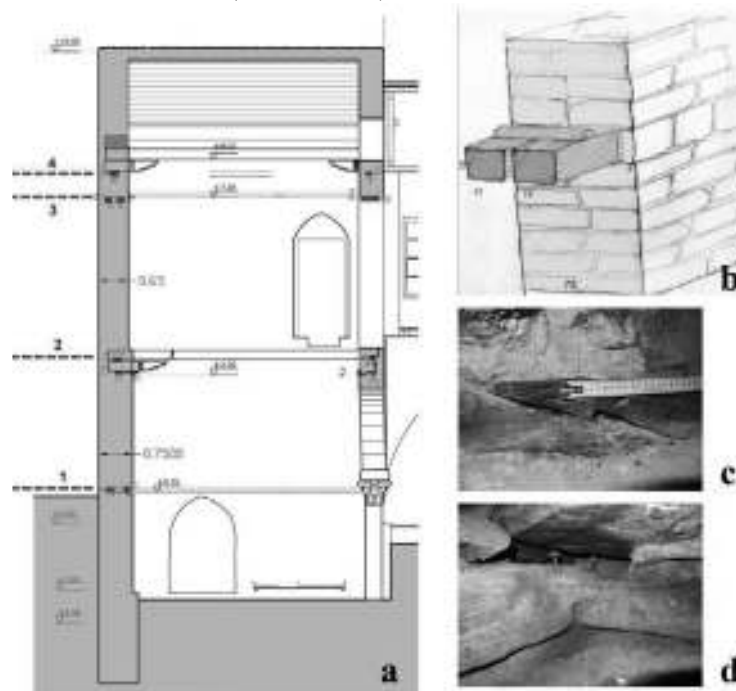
a. Cross-section of the Venetian wing before the restoration, with the 4 levels of timber tie-beams highlighted. b. Sketch of the 1st tie-beam layout with dimensions (S wall). c. Longitudinal Z shaped connection. d. Corner connection of tie-beams
